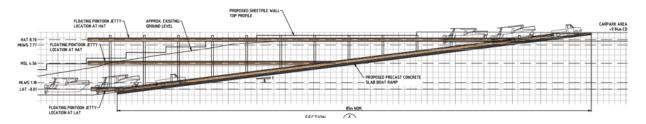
Elevation – Alternative Location – Sheet Pile Wall Option
